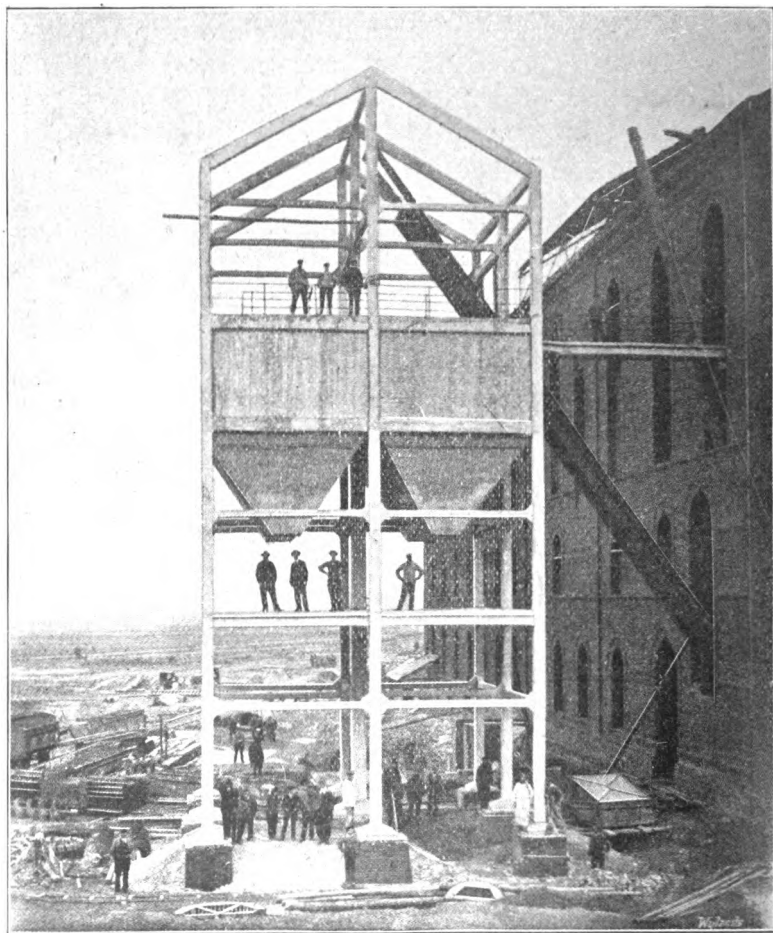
Coal Bins, Foot Bridge and Factory of Reinforced Concrete. The bottom of the bin is 28 feet above the ground.
